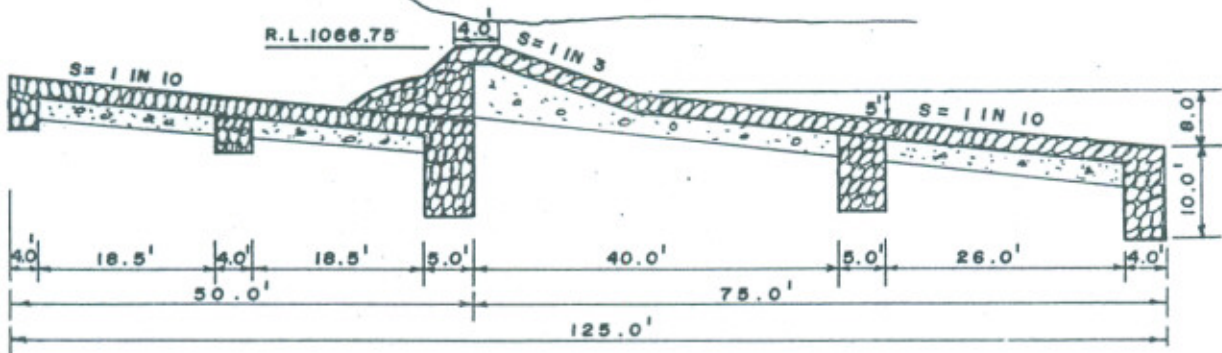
(b) - SECTION OF JOBRA WEIR AT MAHANADI
